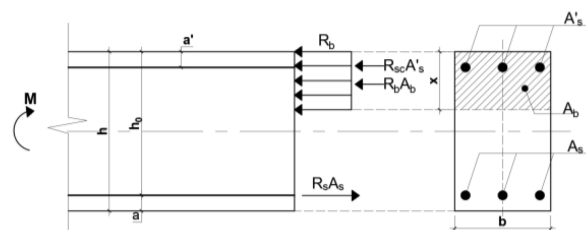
Internal Force and Stress Diagrams in the Cross Section of a Reinforced Concrete Beam [8]
